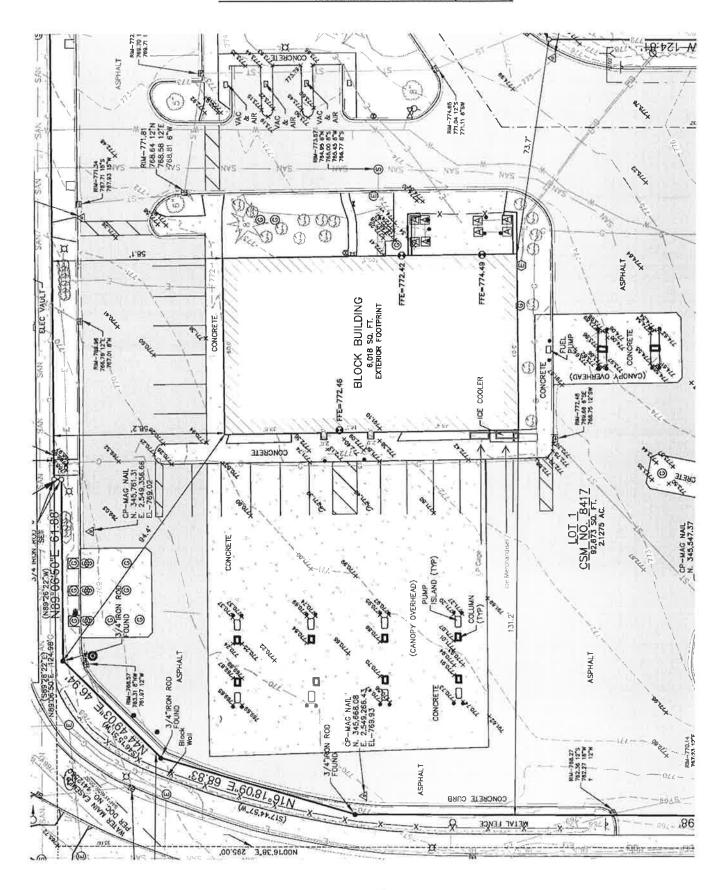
EXHIBIT A: APPROVED SITE PLANS (CONT'D)
